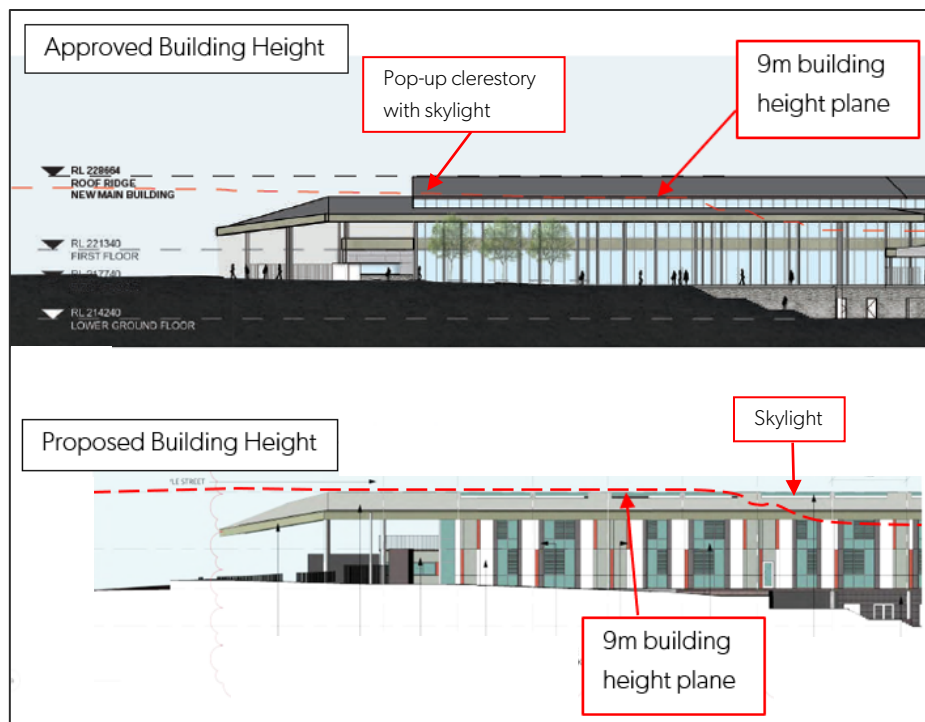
| Proposed and approved main building height (source: Section 4.55 Modification Application, 2019)
